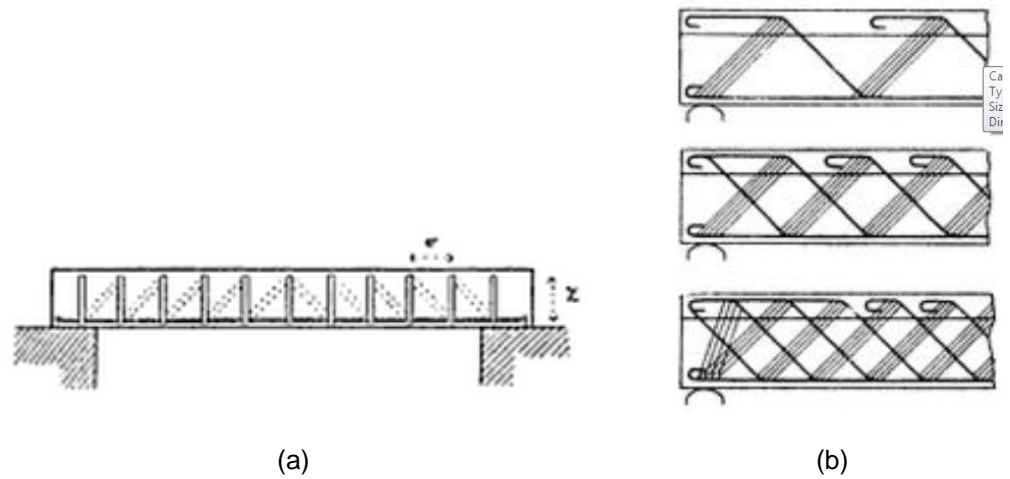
Hennebique reinforcing (a) Hennebique trussed framework model, 1899 (b) Morsch's trussed framework model [32]
